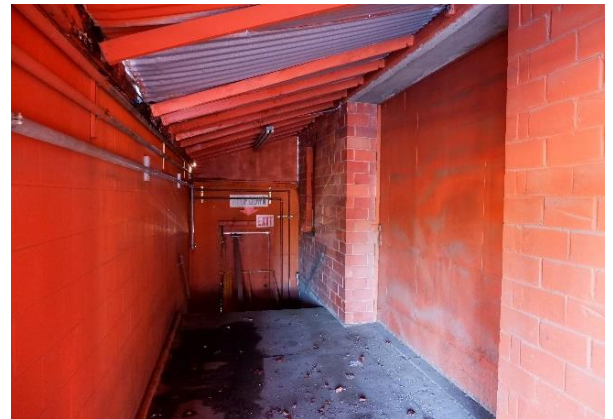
Section of loading dock between 1931 warehouse (right) and adjacent building at 1125 Arguello Street (left), looking east toward door opening onto Arguello Street.
